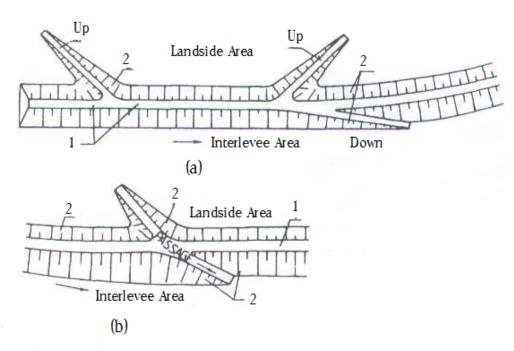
Levee passages a) Two-way levee passage b) One-way levee passage (Source: Przedwojski, 1995)
